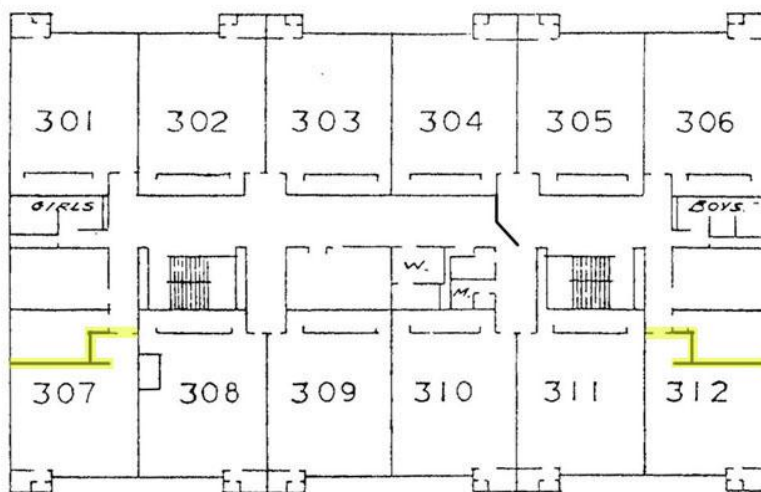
Third Floor Plan, NTS. Cook School. Accessed from St. Louis Public Schools Building Revitalization Collaborative. Accessed July, 2021. <https://www.slps.org/domain/8785>. Modifications from original plans are highlighted for reference.
